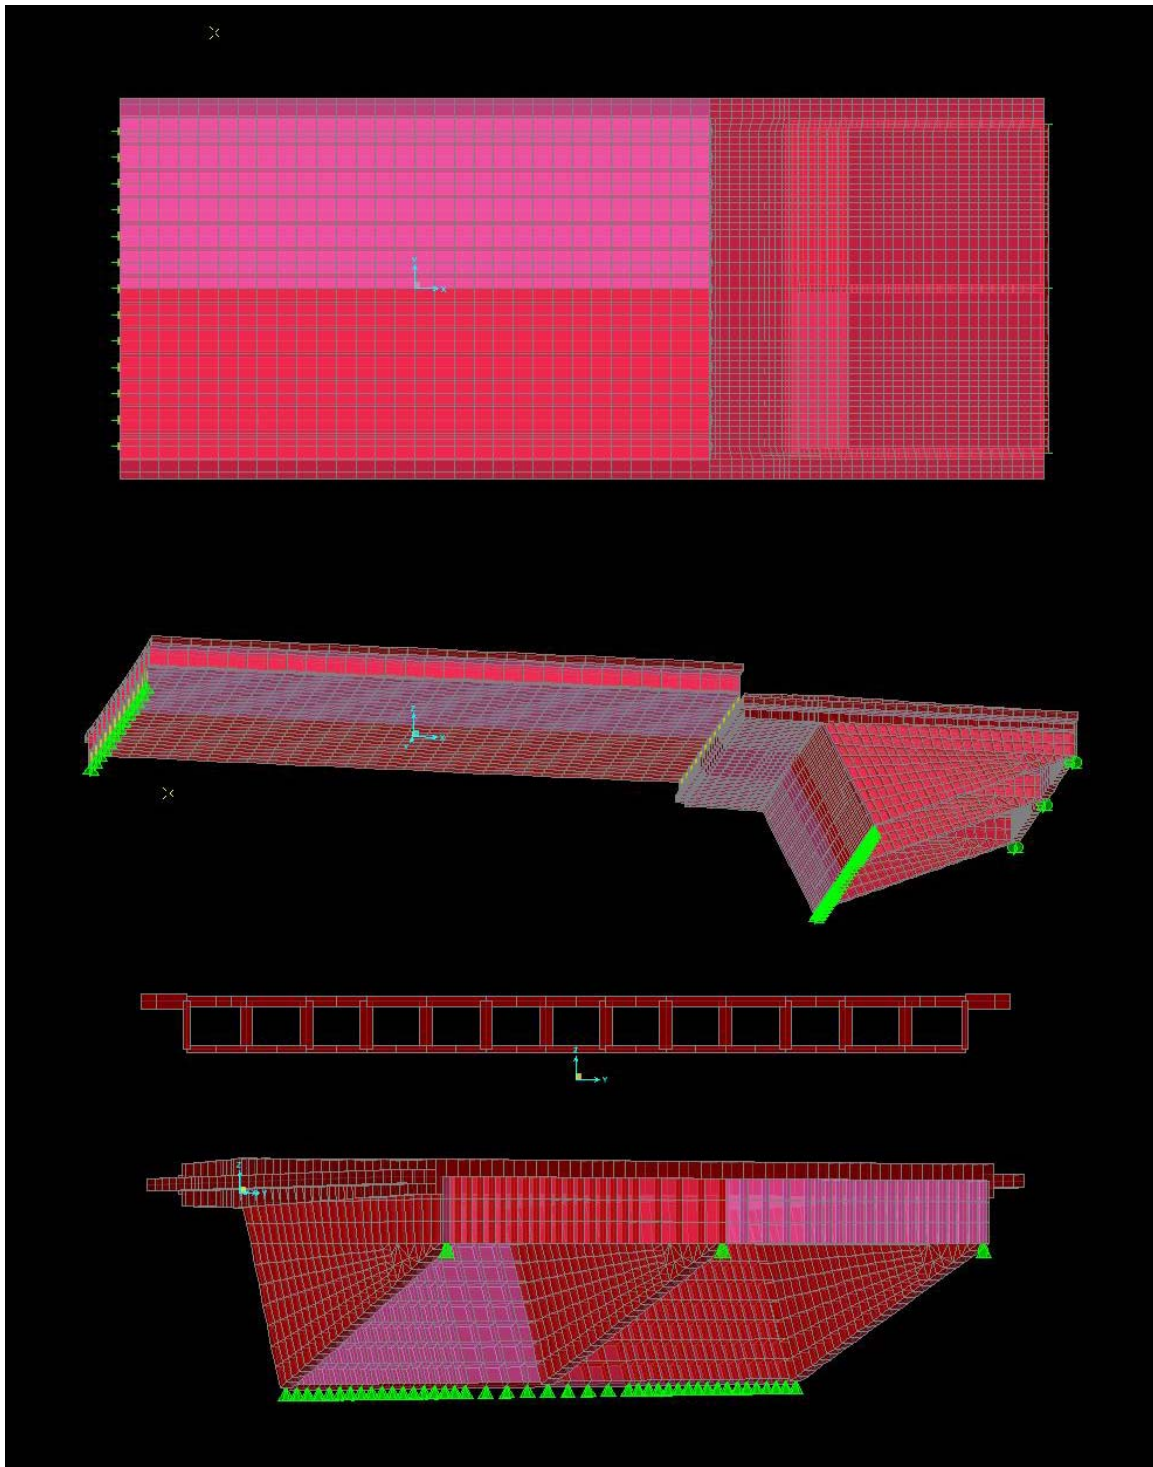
Illustrations of the 3-D analysis model: plan view, general view, cross section of the central span and view of the East abutment seen from the back side
